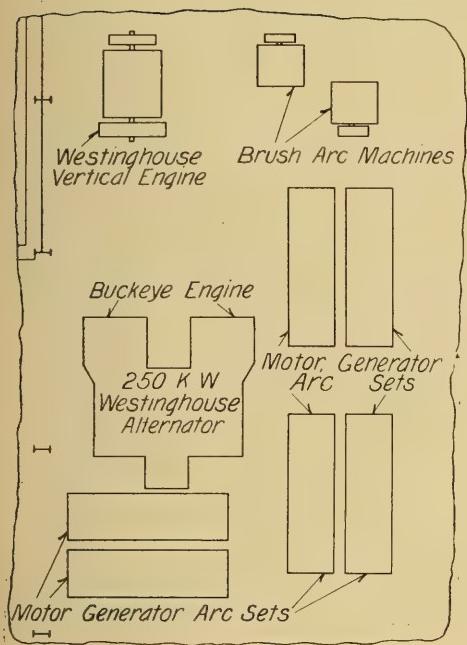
PART OF FLOOR PLAN, NORTH SIDE LIGHT PLANT, SHOWING SPACE OCCUPIED BY ARC SETS UNDER OLD SYSTEM.
